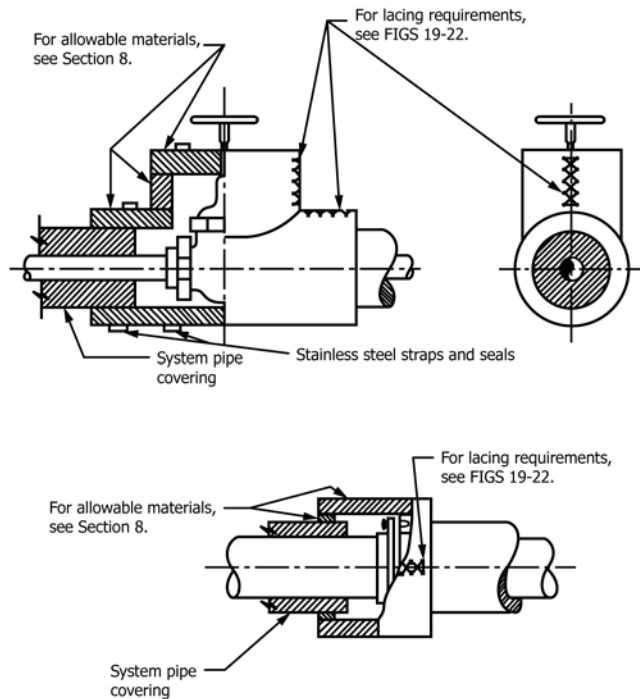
Installation of Removable/Reusable Blankets for Valves, Fittings, and Flanges
